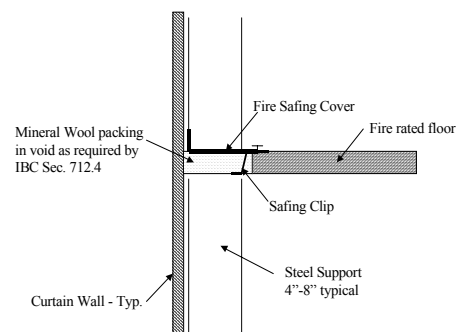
Exterior Curtain Wall/Floor Intersection with no interior wall
